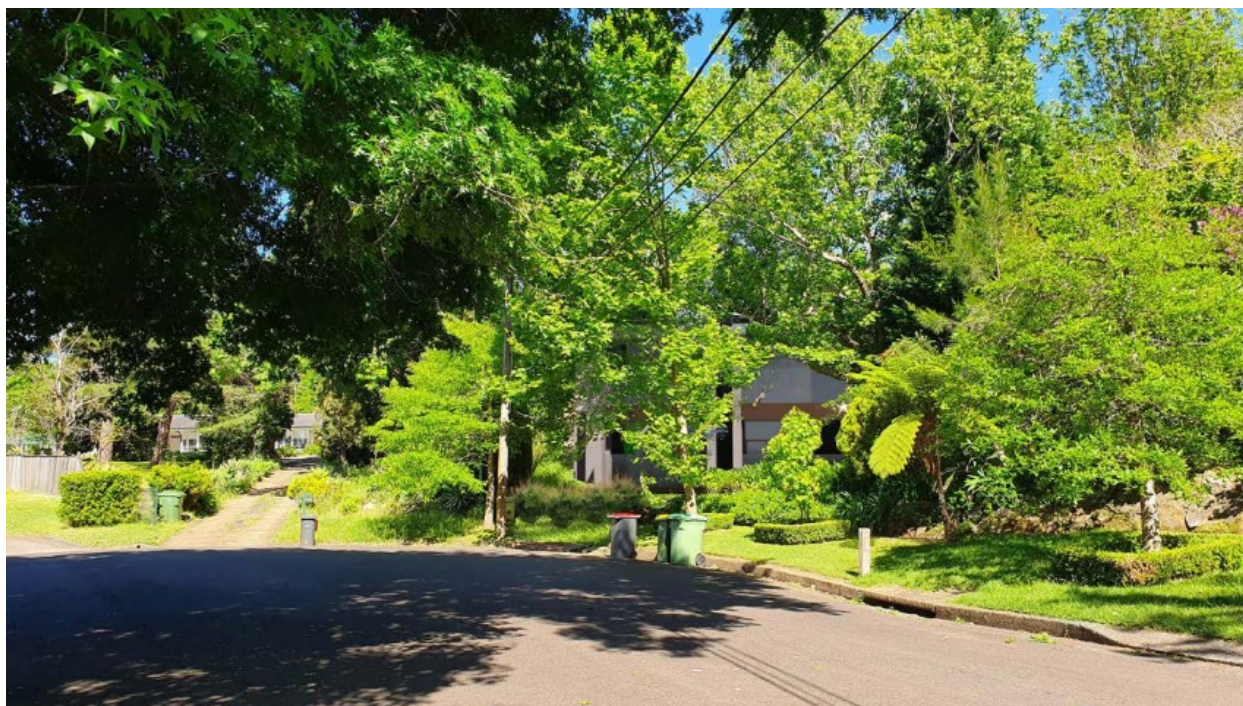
| Streetscape photomontage of development as viewed from Flinders Avenue (Source: Applicant's Visual Impact Assessment)
